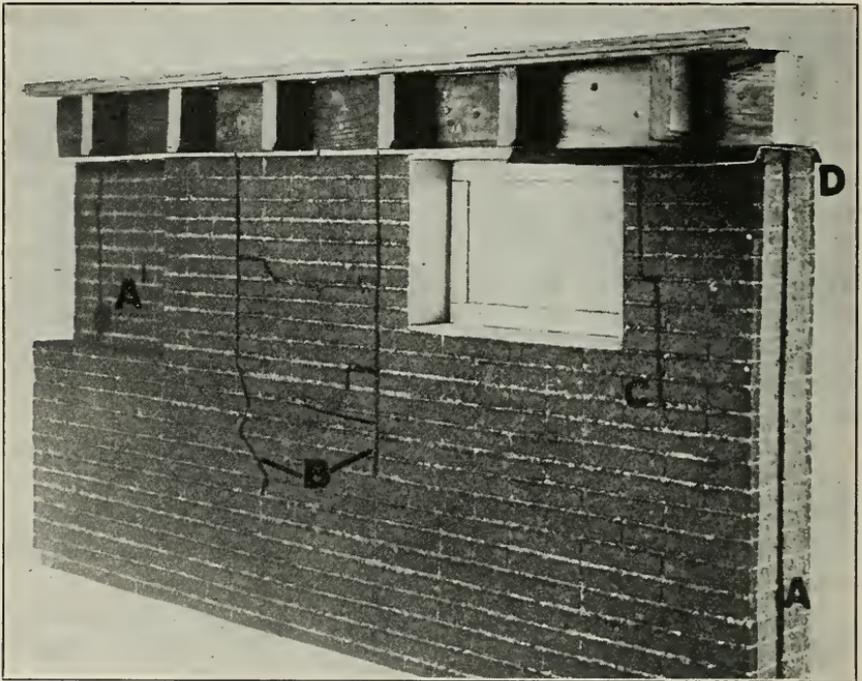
Section of Brick Wall Showing Certain Features of a Termite Infestation
